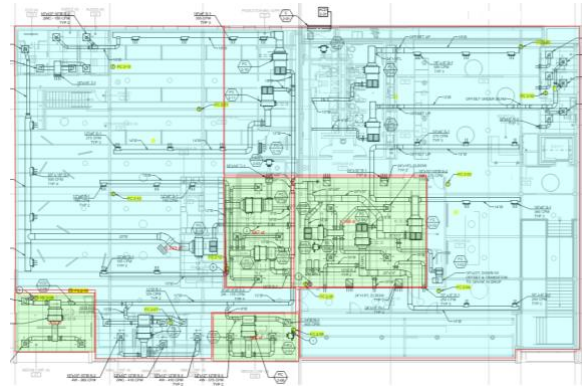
EXAMPLE FLOOR PLAN OF DOAS VENTILATION ZONES WITH LIMITED DCV ZONES, SACRAMENTO SITE
